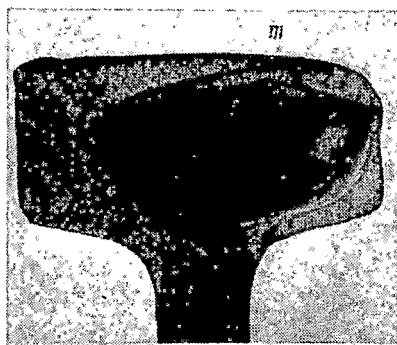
Rail fracture with a transverse fatigue crack.
